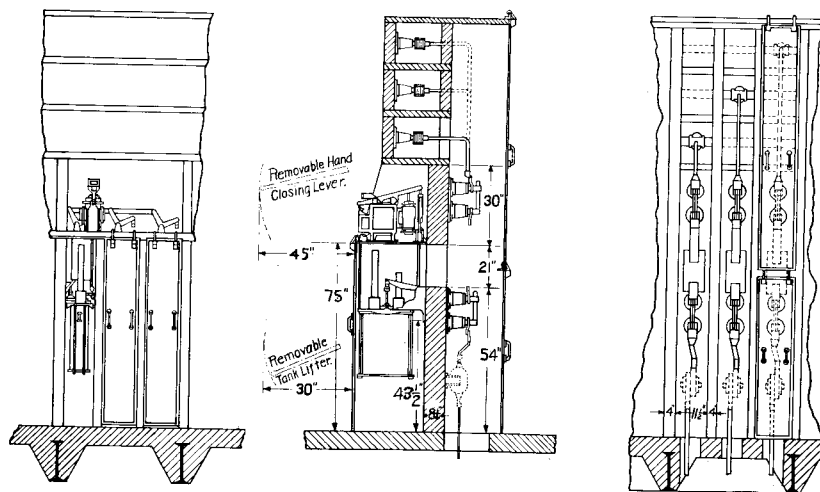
Oil Circuit-Breaker and Bus Structure, Enclosed Construction, Cell Mounting, Arrangement—One-Breaker Single-Bus System
